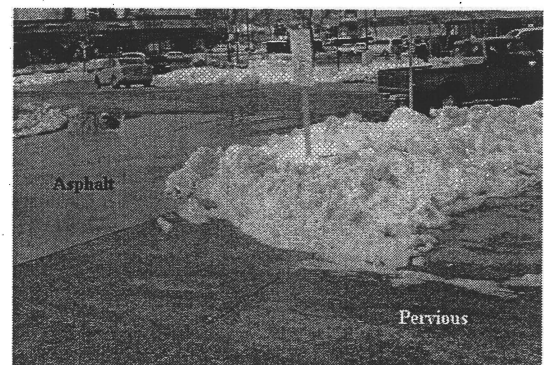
POC and asphalt pavements after a snowfall [10]
